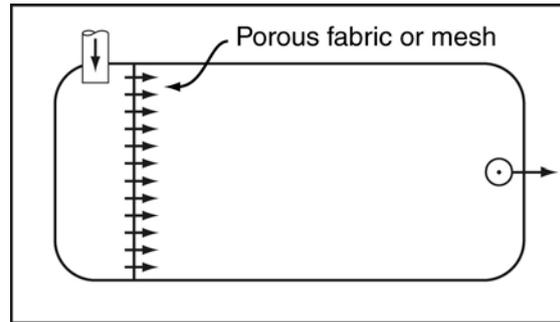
(a) – Porous barrier with piped inflow entering from side of basin
